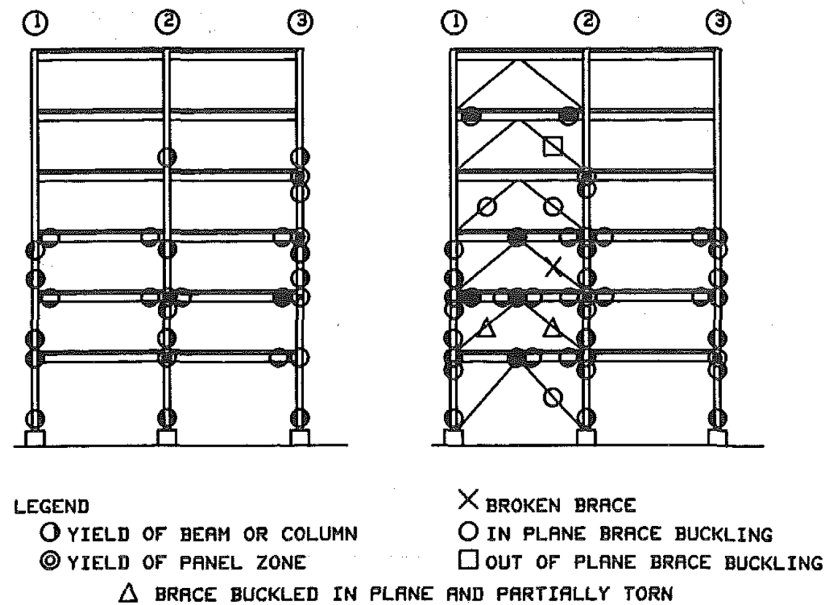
Six-story US-Japan specimen damage after final test (Foutch et al. 1987)
